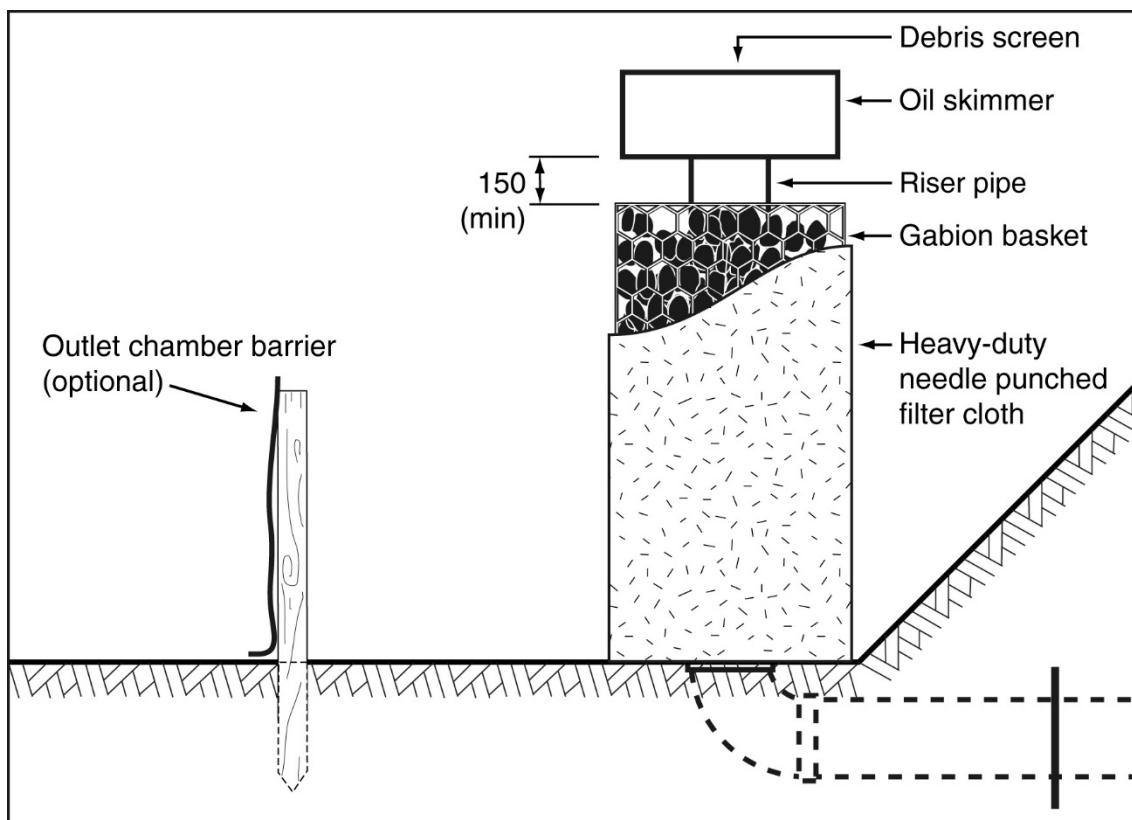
Typical details of riser pipe outlet with rock-filled gabion baskets
